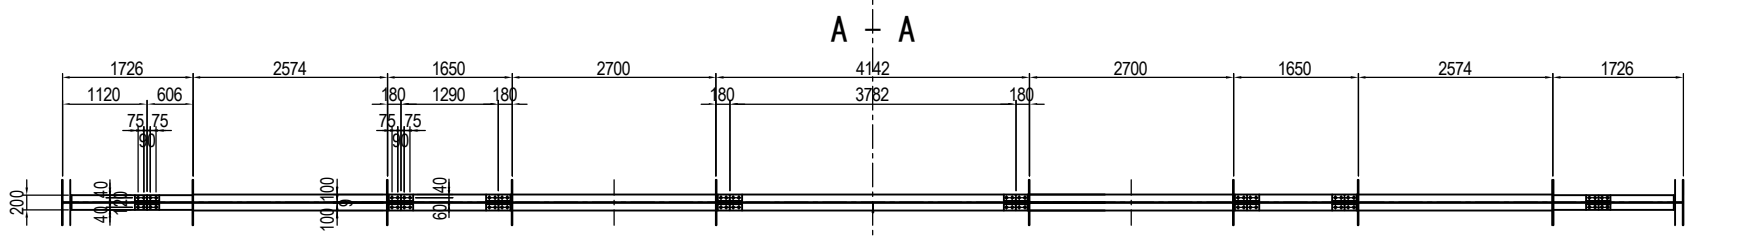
# DETAIL OF CROSS GIRDER (3) (C3) S=1:100
